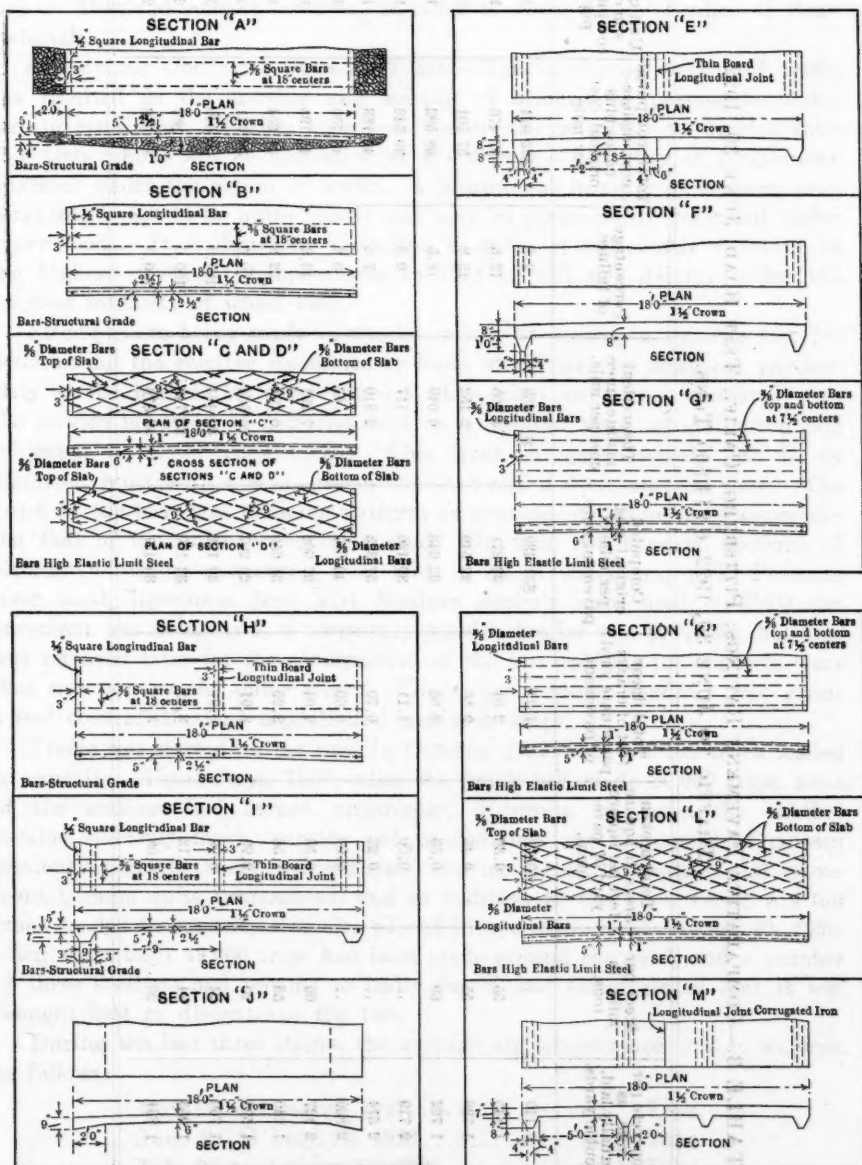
DETAILS OF VARIOUS SECTIONS OF PAVEMENTS FOR WOOD TESTS AT PITTSBURG, CALIF.
